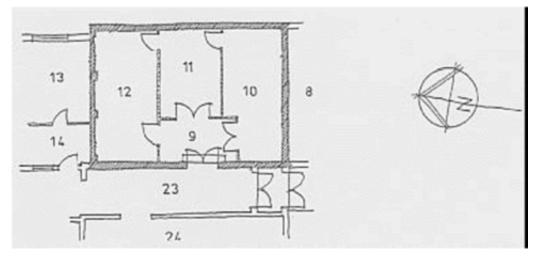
Sketch plan of the former coach house Source: O'Connor, Part II
